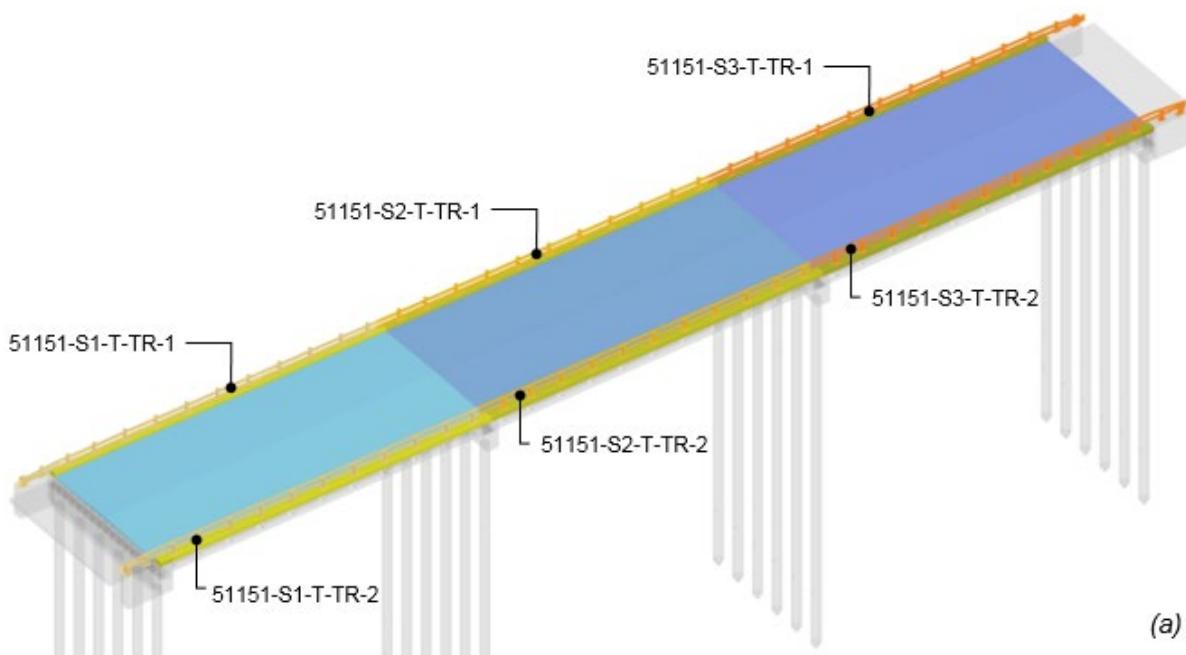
(b) – Naming convention for bridge deck objects
